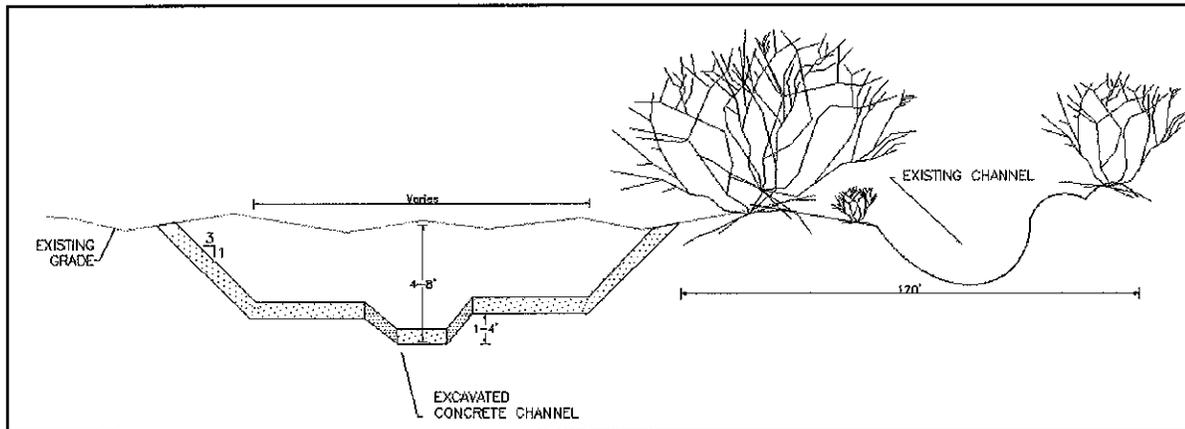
Concept Cross Section for Concrete Companion Channel (Alternative C) (Not to scale)
